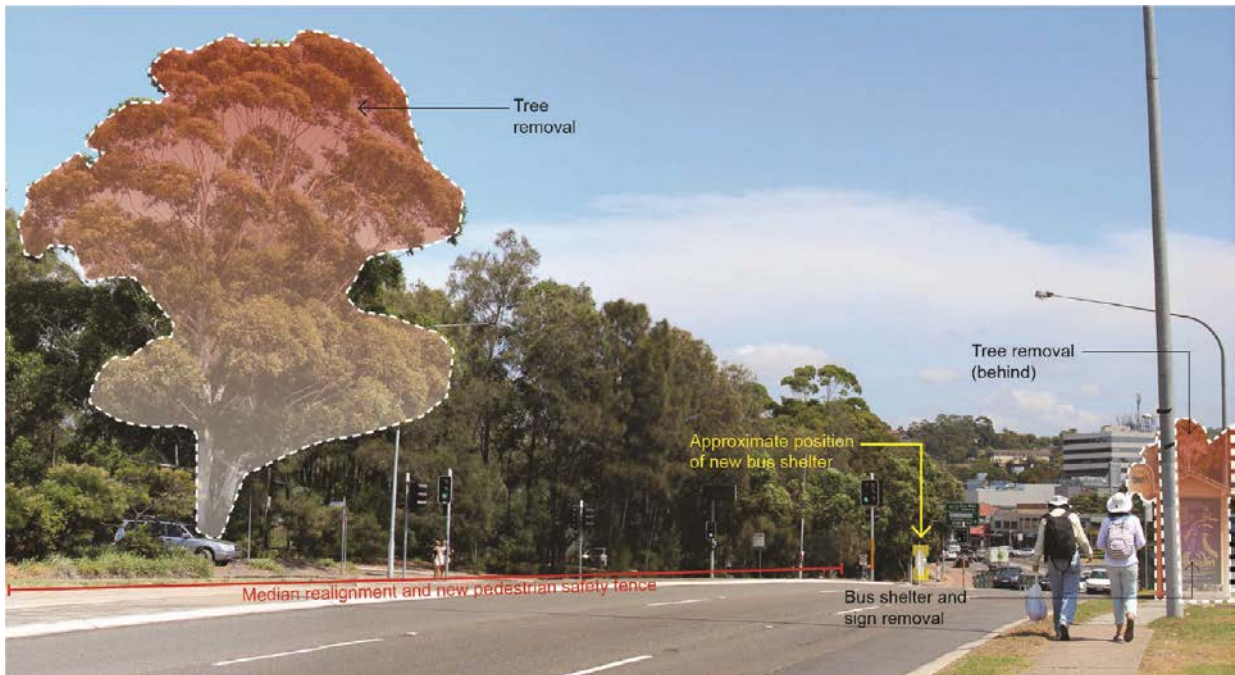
Viewpoint 2: View looking west along Barrenjoey Road
